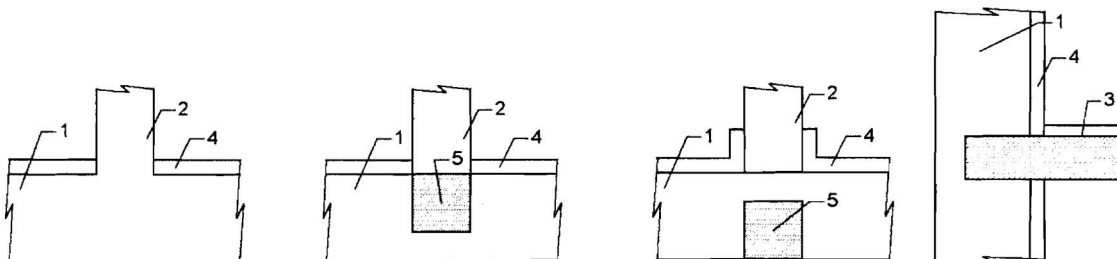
Heat and mass transfer bridges at the junction between the external and internal building elements: 1- masonry external wall; 2- masonry internal wall; 3- reinforced concrete floor; 4- additional thermal insulation layer; 5- reinforced concrete element
